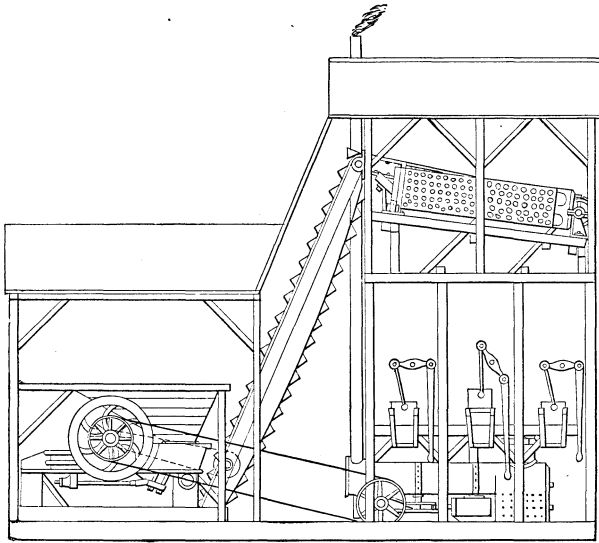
Stationary crushing plant. Elevator, screen, and bunkers complete.
